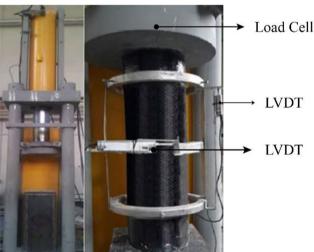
Test setup, (a) Hydraulic jack (b) Specimen with mounted extensometer
